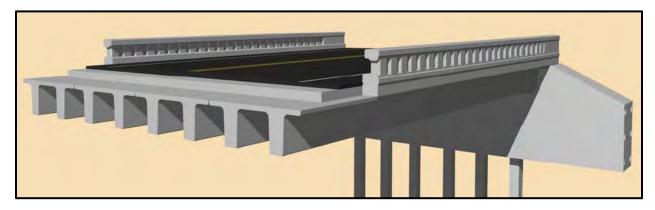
Northeast Extreme Tee Beam Bridge
